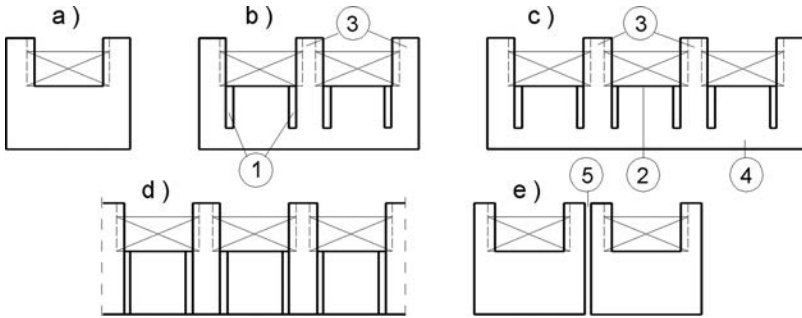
Dividing of dams into sections. (a) Dam with one span, (b) with two spans, (c) with three spans; (d) training walls separated from the overflow; (e) two parted sections. (1) Cut-joint; (2) overflow crest.
